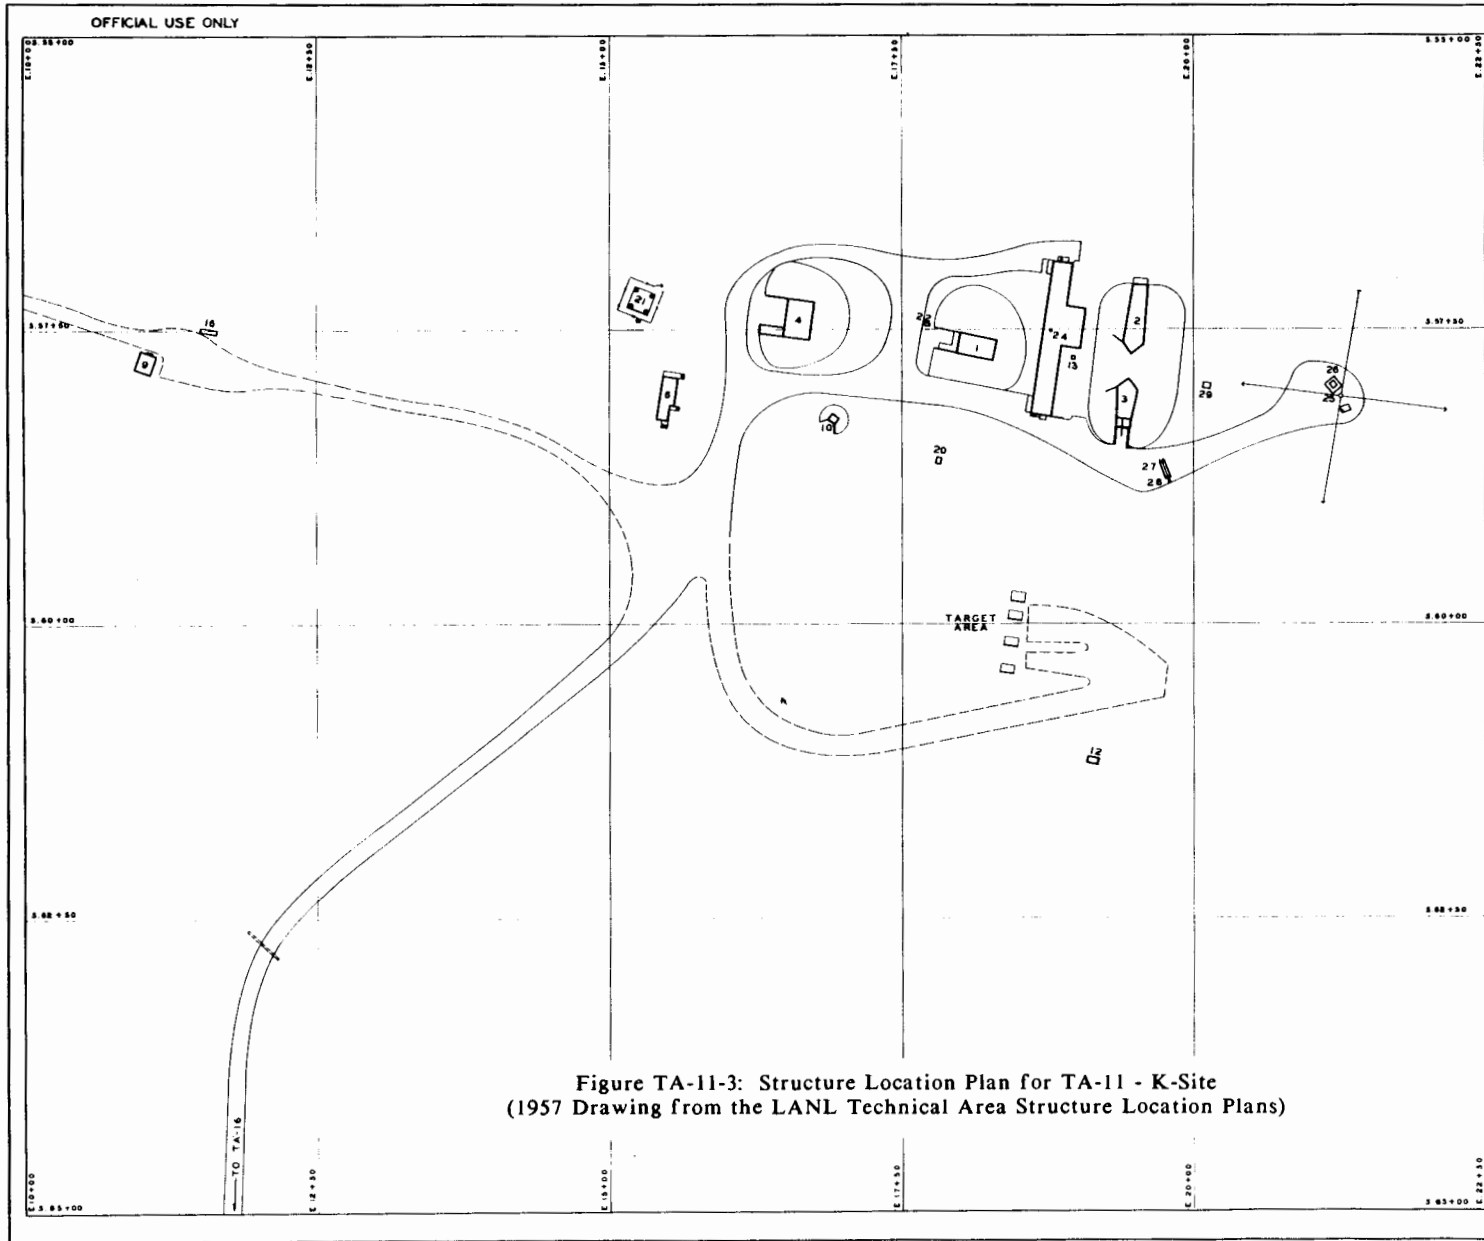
Structure Location Plan for TA-11 - K-Site
